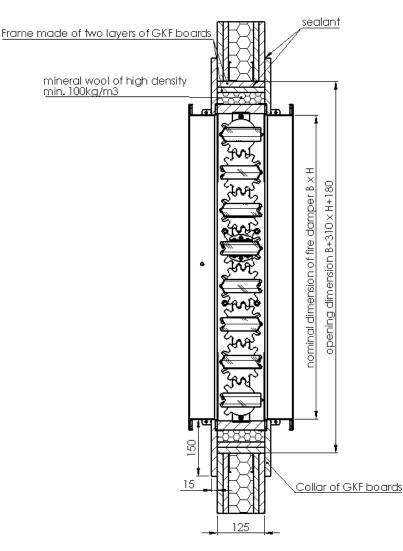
Installation technology of WKP-0-0 fire damper in light wall structure
